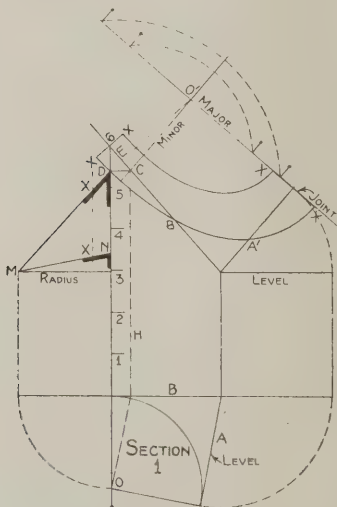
Development of the Face Mold for Section I Using String and Pins
